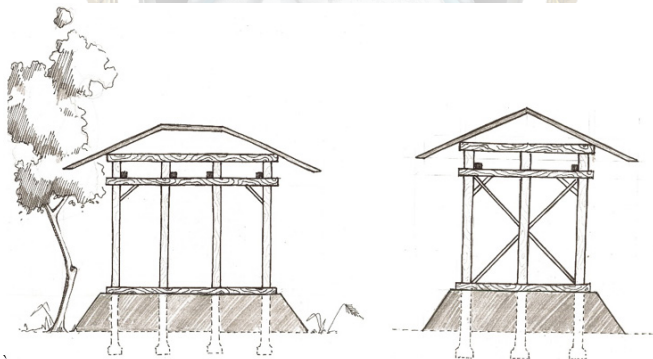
Sections of BRAC Shelter (Source: Shelter Cluster)
